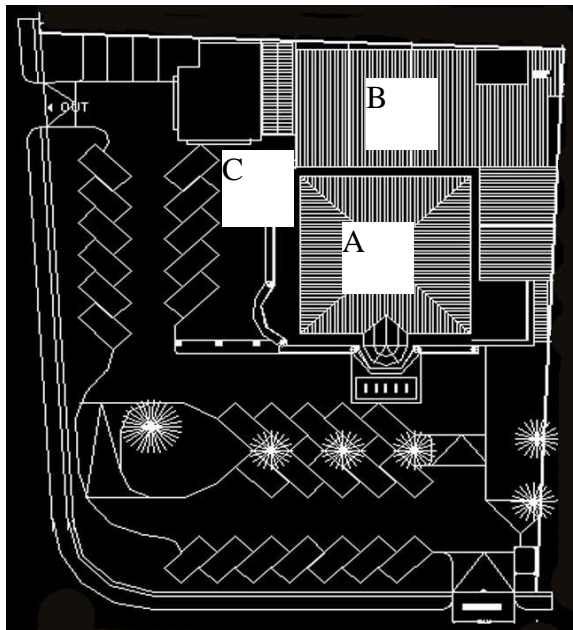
Section of addition building at back side, which showing the optimally used of space.
